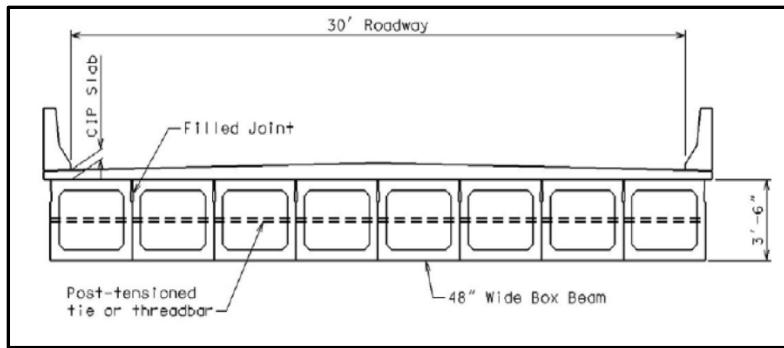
Typical Section of Box Beam with Transverse Reinforcement (Murphy et al., 2010)
